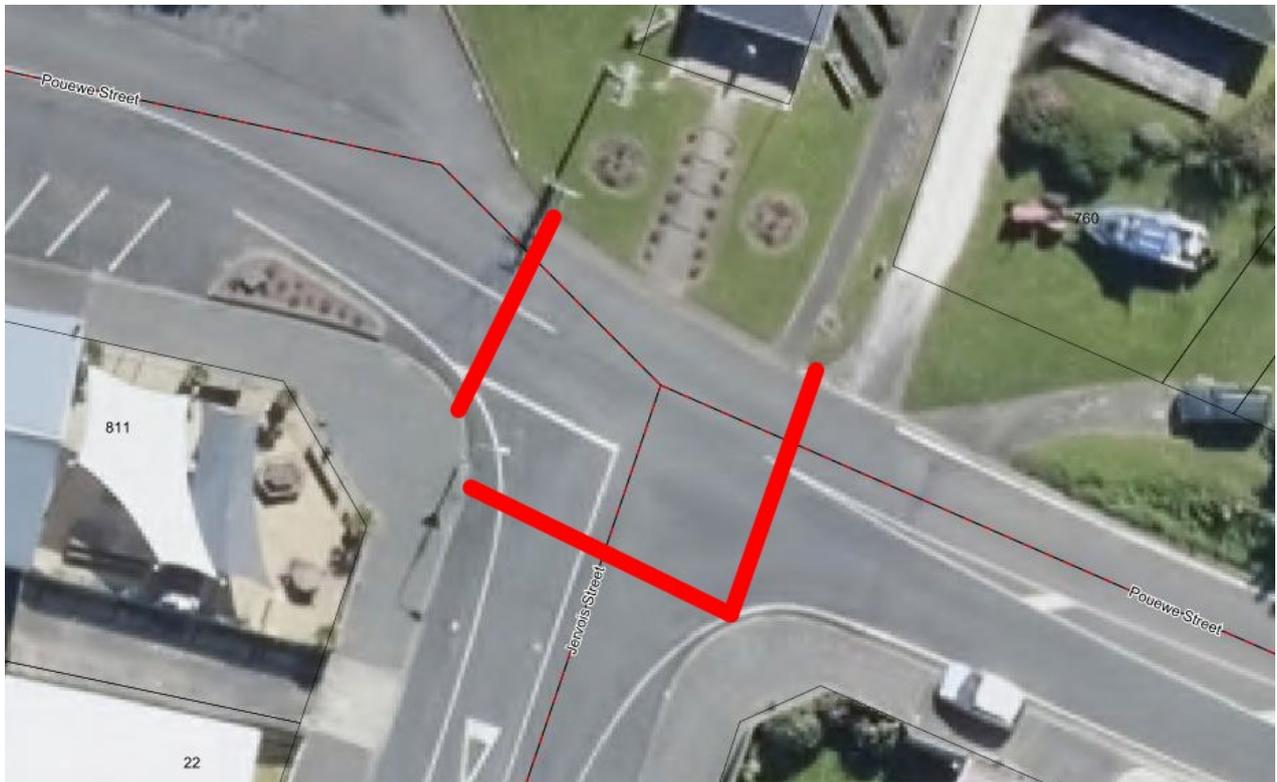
Aerial view showing proposed locations of raised pedestrian platforms at the Jervois Street and Pouewe Street intersection
